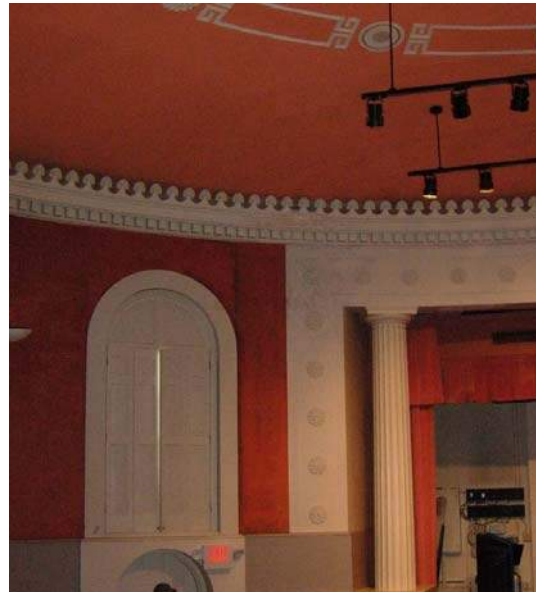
Interior Plaster Damage corresponding to downspout and scupper, roof area "C" North
